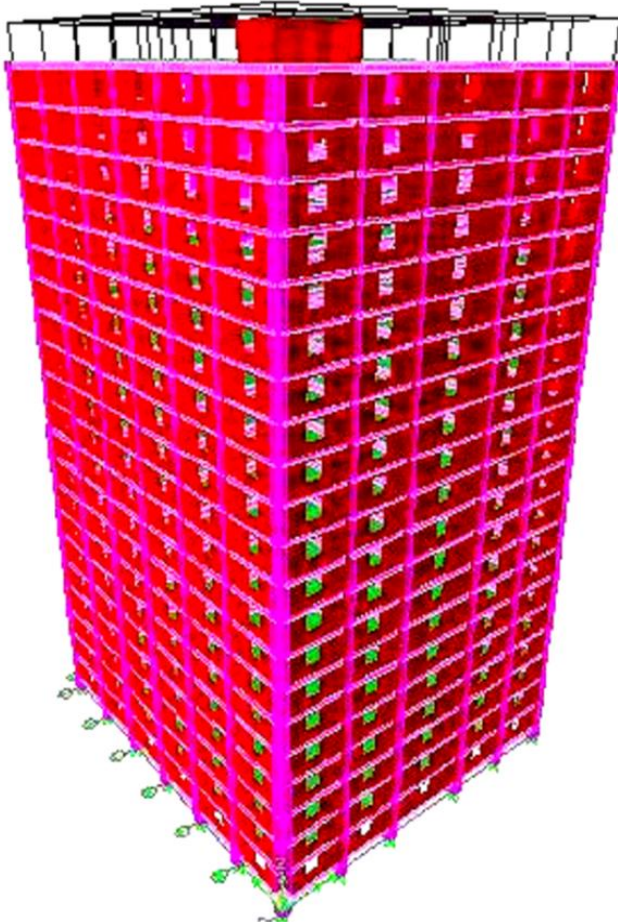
3D view of a G+ 20-story structure with in fill walls with a height of 64.5m.
